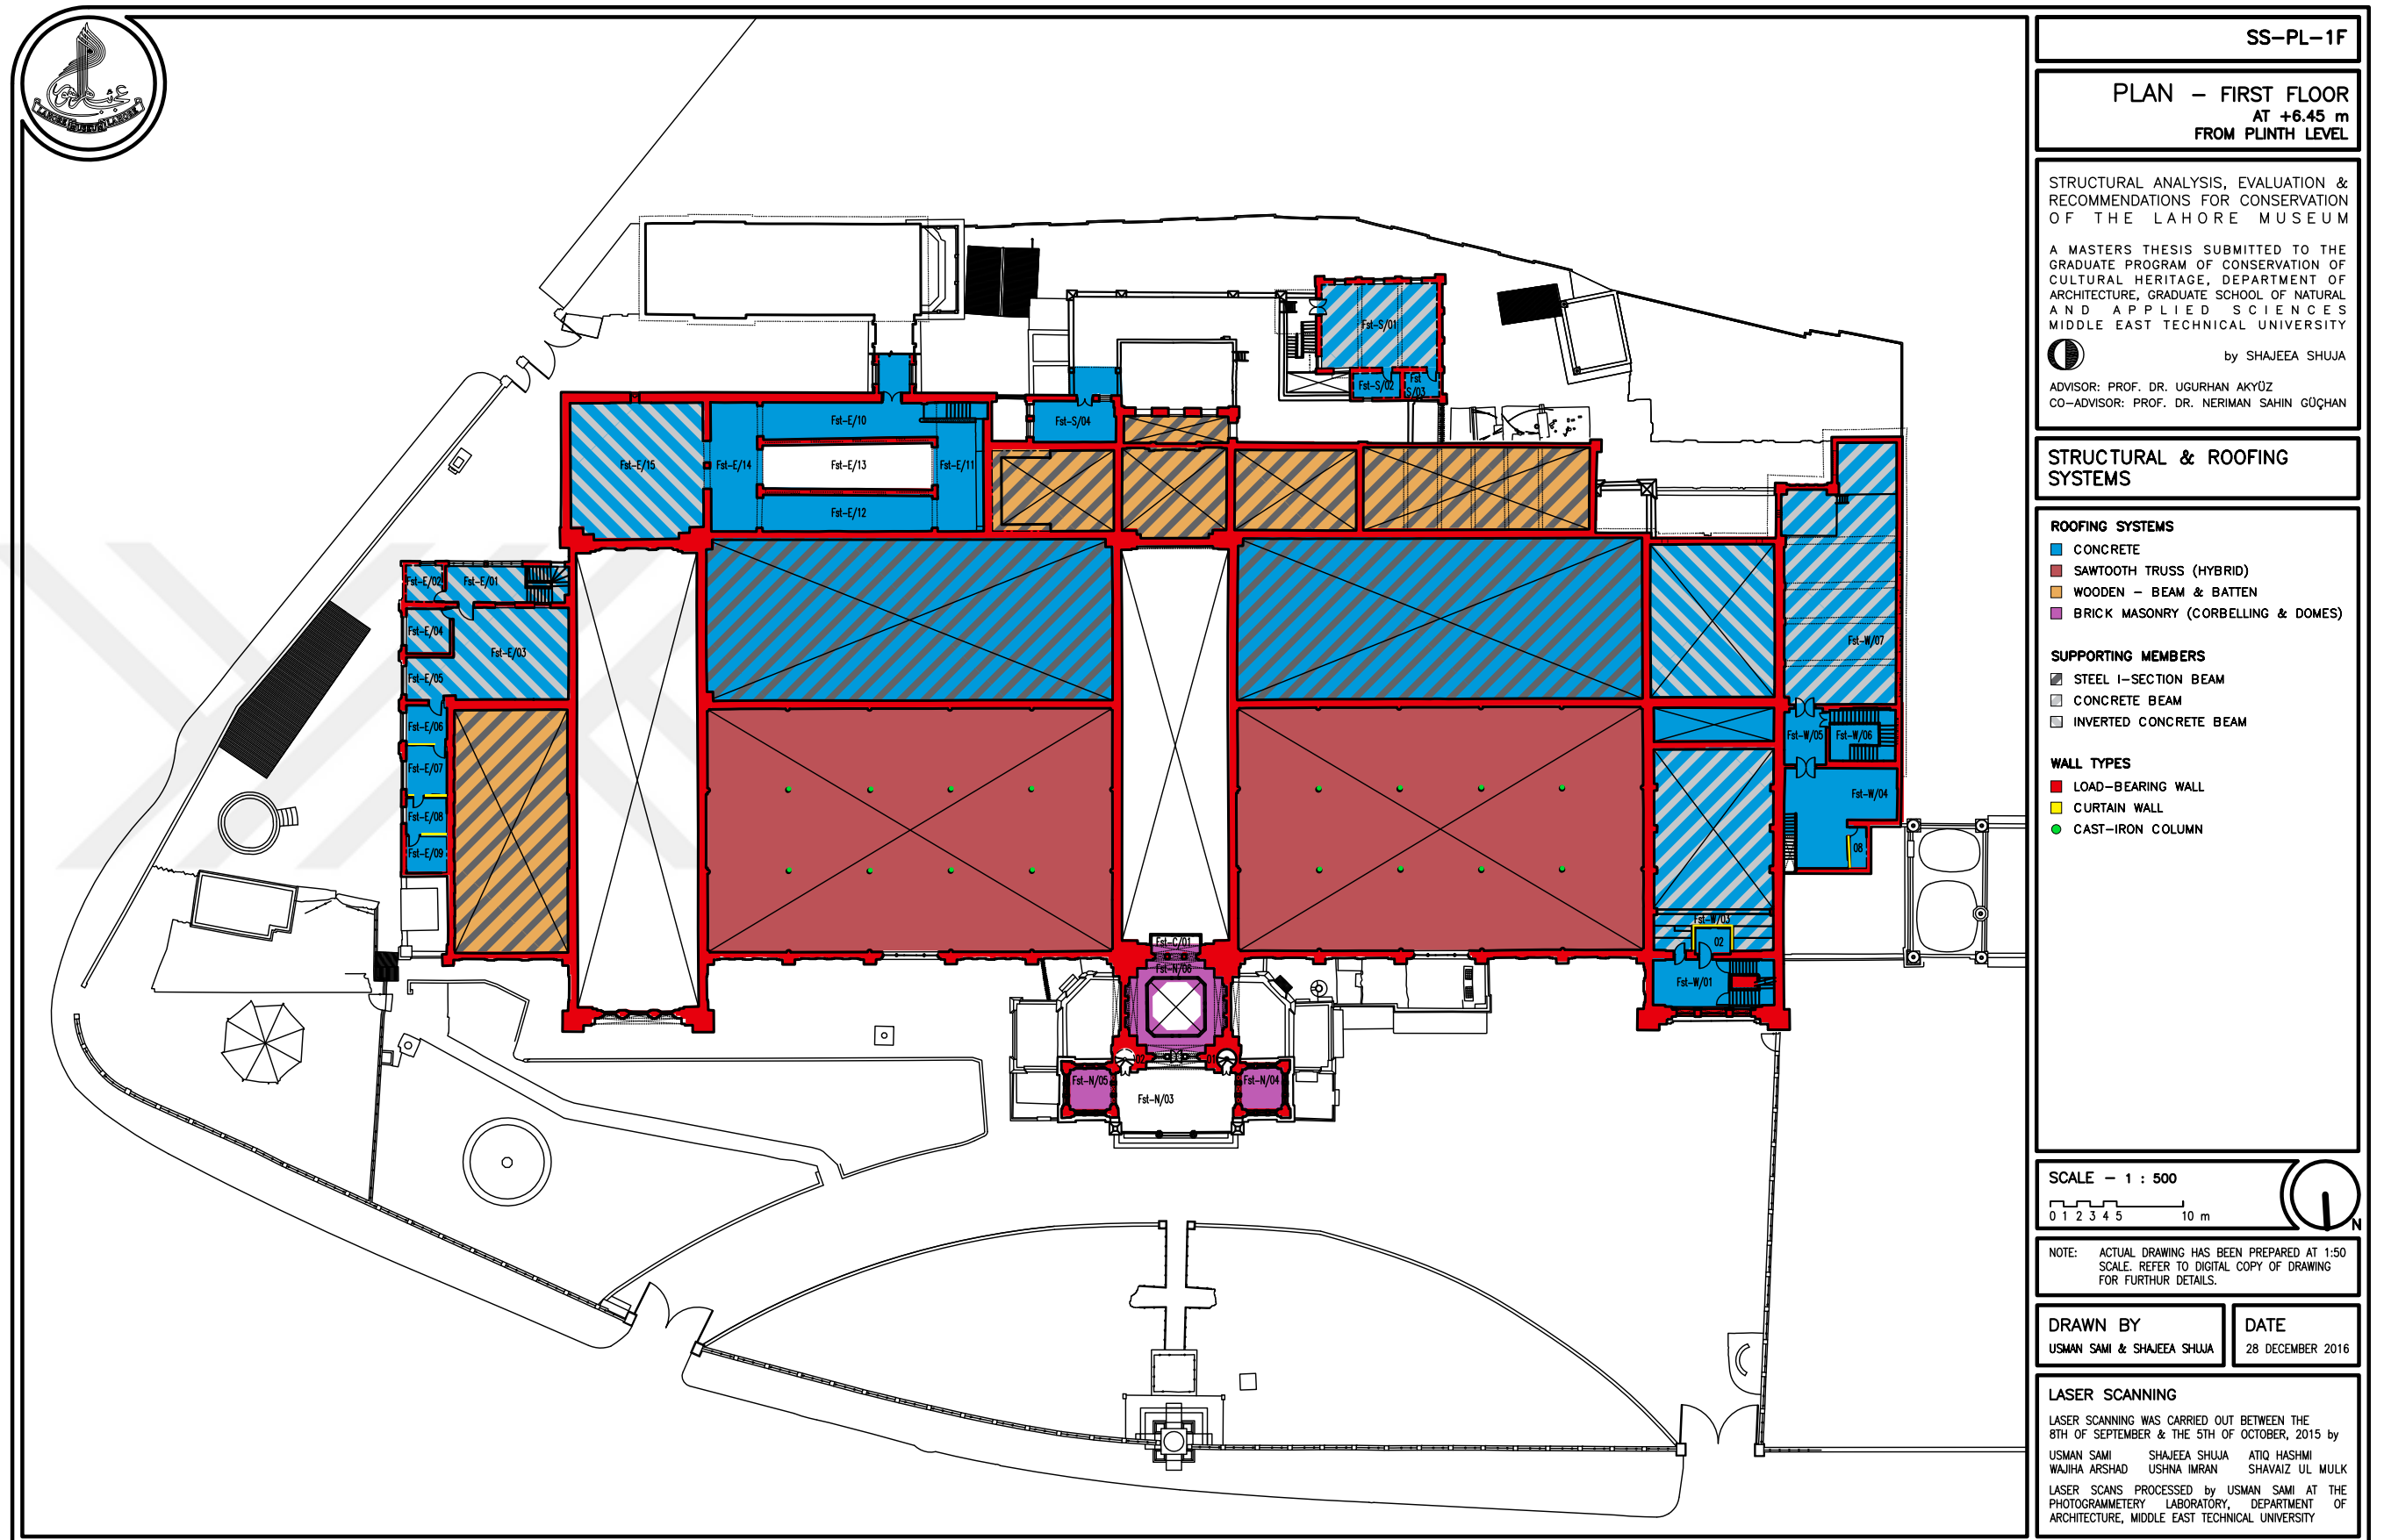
SS-PL-1F – Structural & Roofing Systems – Plan – First Floor (2016)
